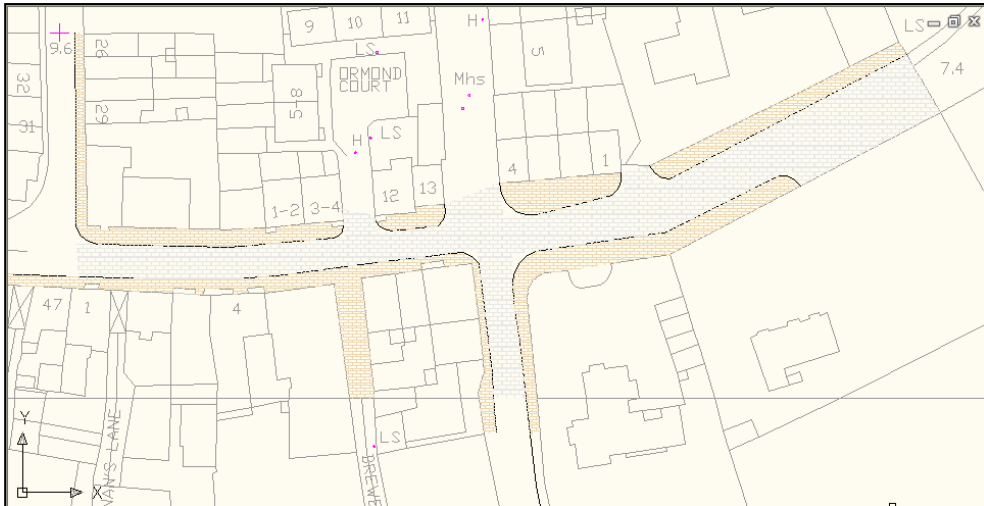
Example of Possible Public Realm Improvements for Castle Street
